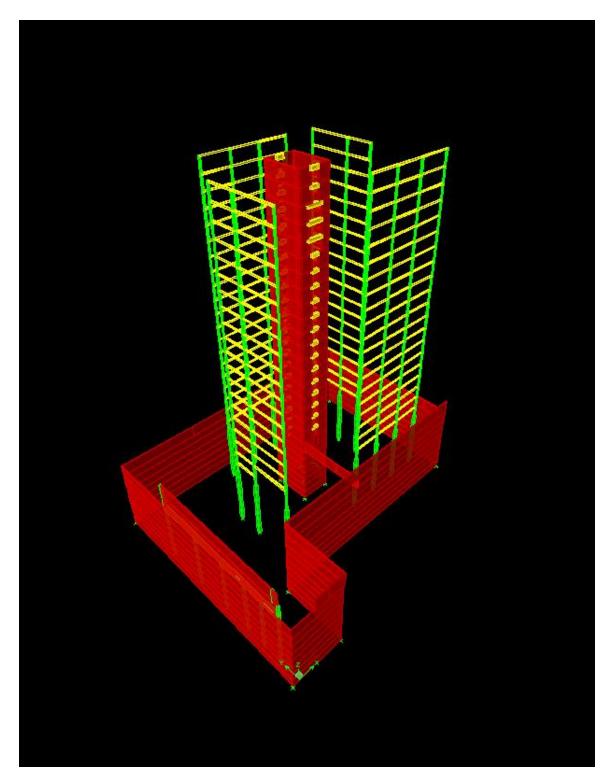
Existing Dual Core and Moment Frame Lateral System.
